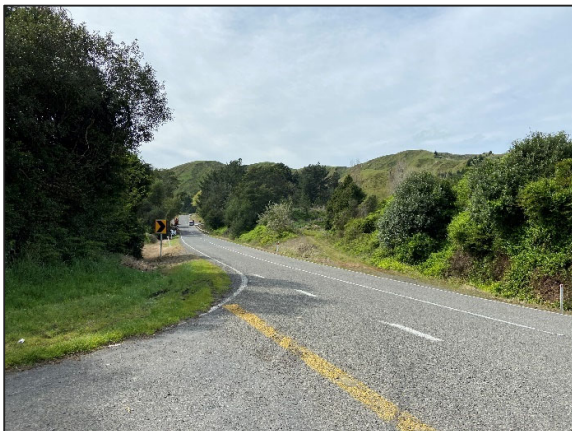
Figure 2 4: SH2 / Putorino Station Road Intersection - looking east towards SH2
